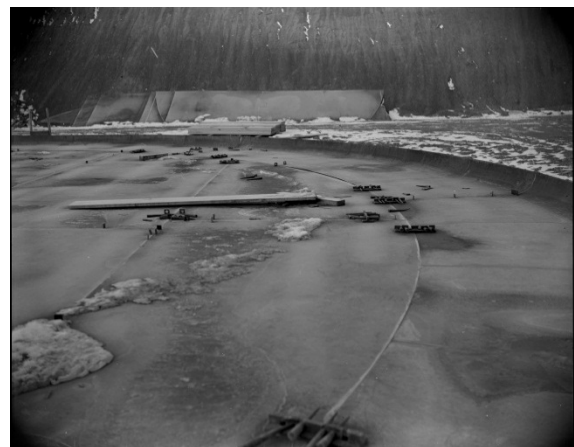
Radial Welded Section of Secondary Bottom, Tank AY-101 (Photo No. 8049) (Taken 12/26/1968)
